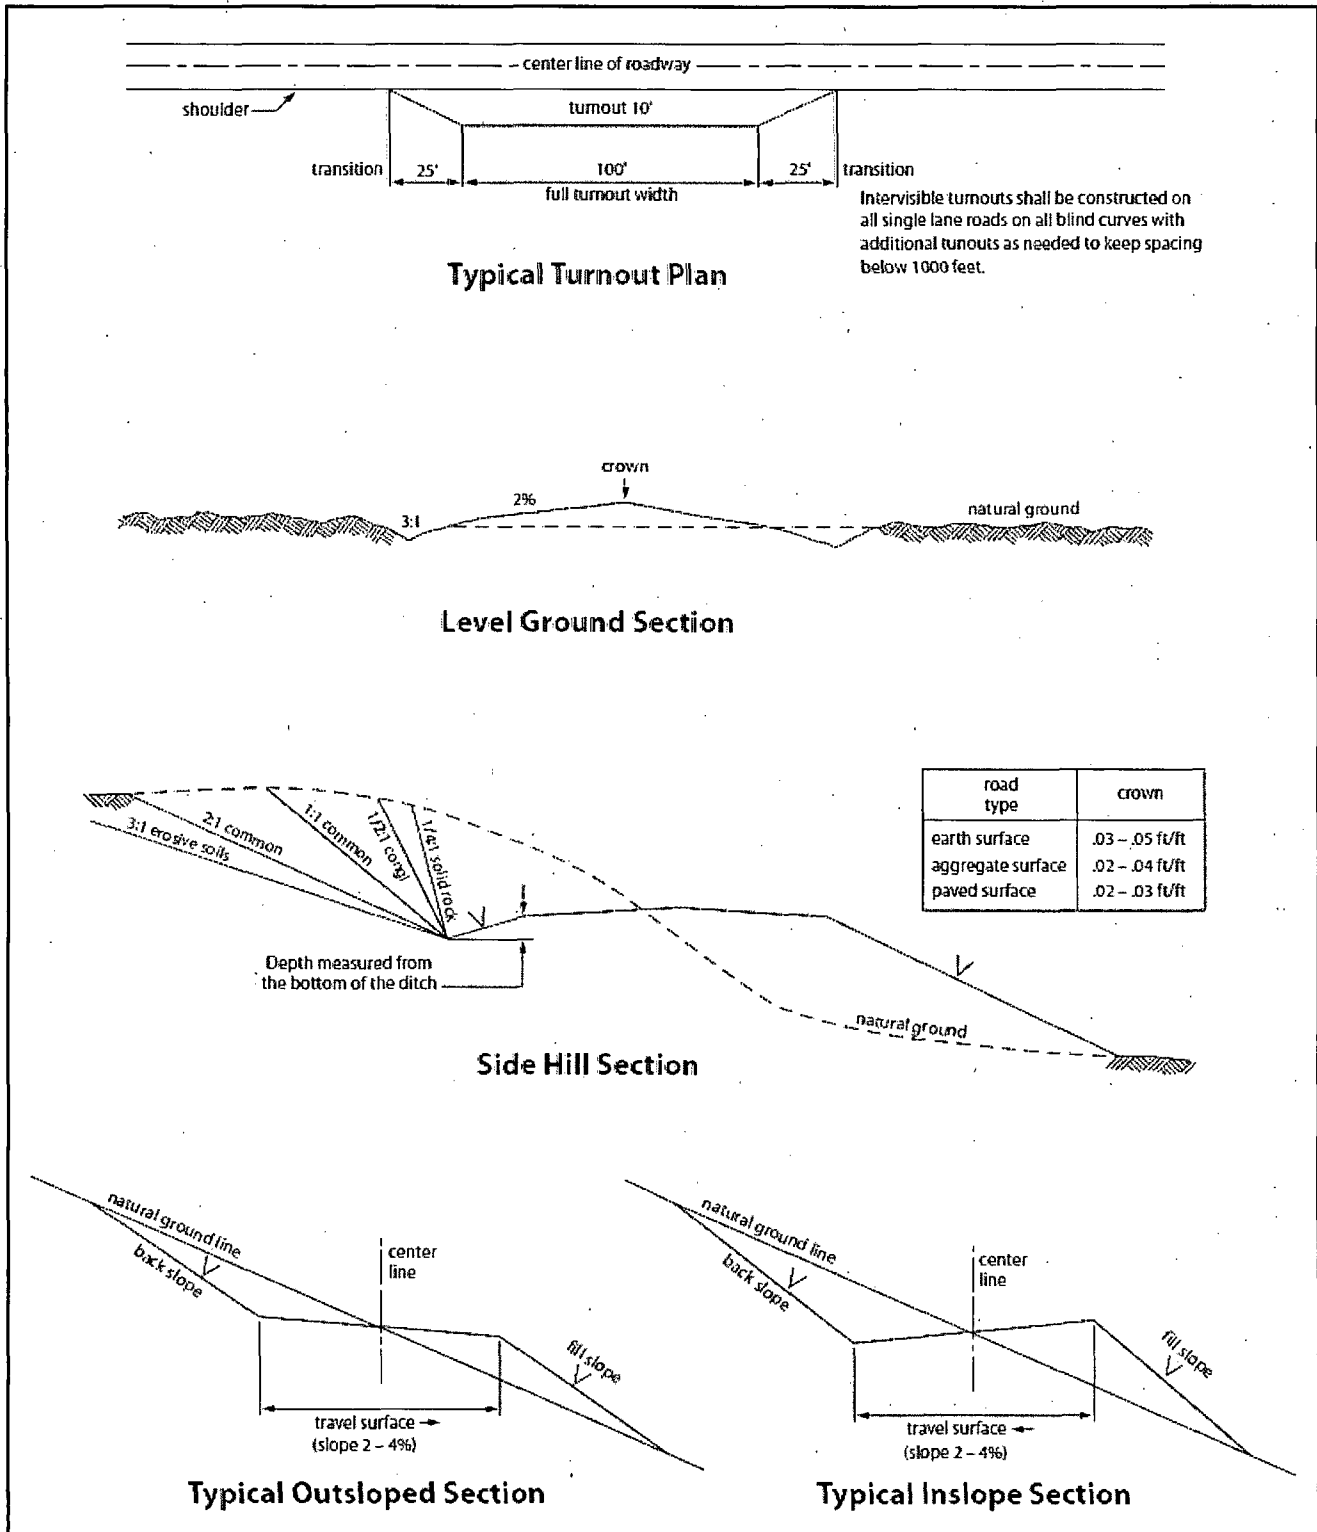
Cross-sections and plans for typical road sections representative of BLM resource or FS local and higher-class roads.
